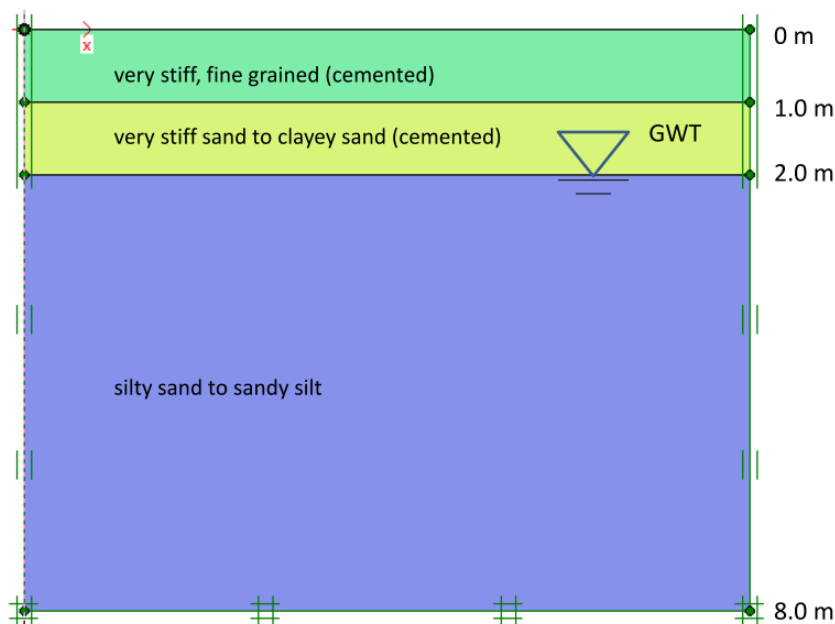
Soil profile for the test at Porto footing load test site on saprolitic soil.
